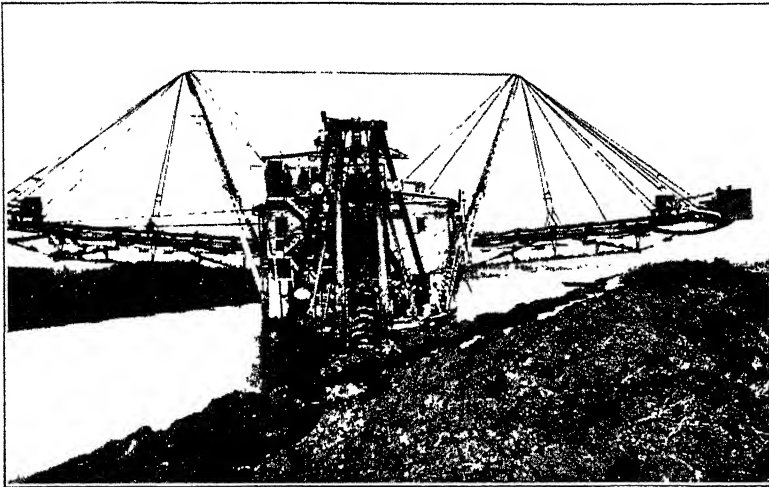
Elevator Dredge Excavating Large Drainage Ditch
